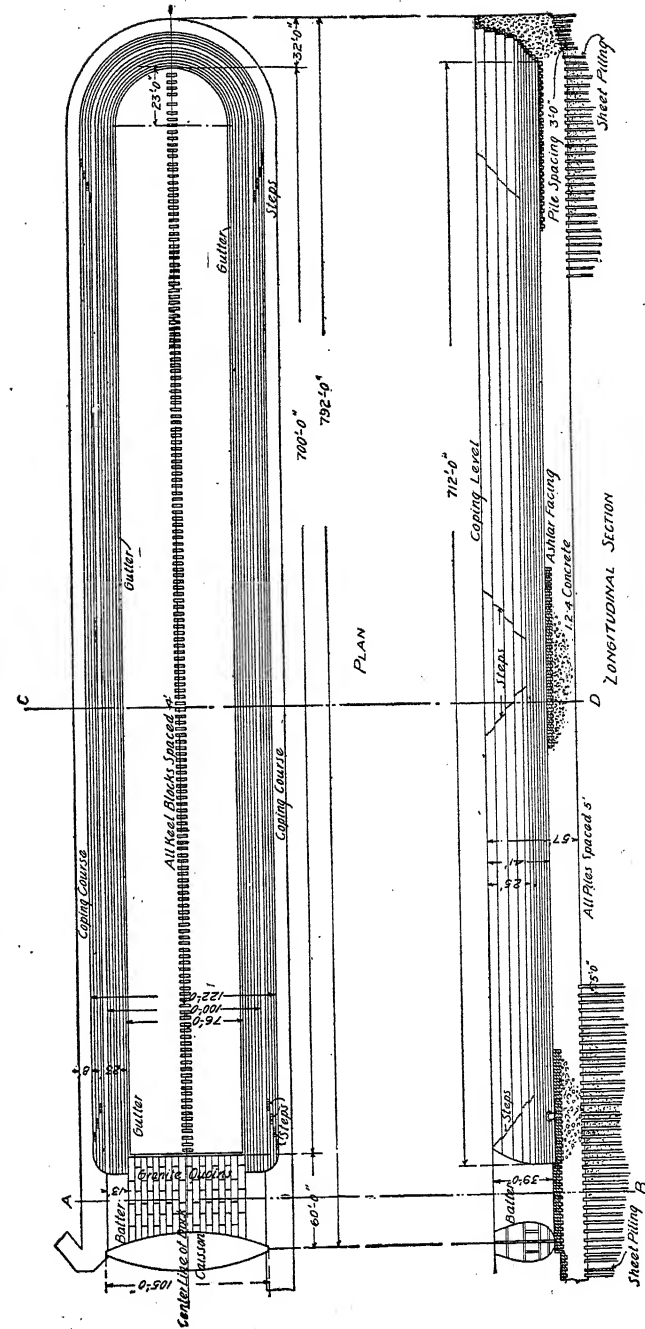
Typical Plan and Sectional Elevation of a Dry Dock
